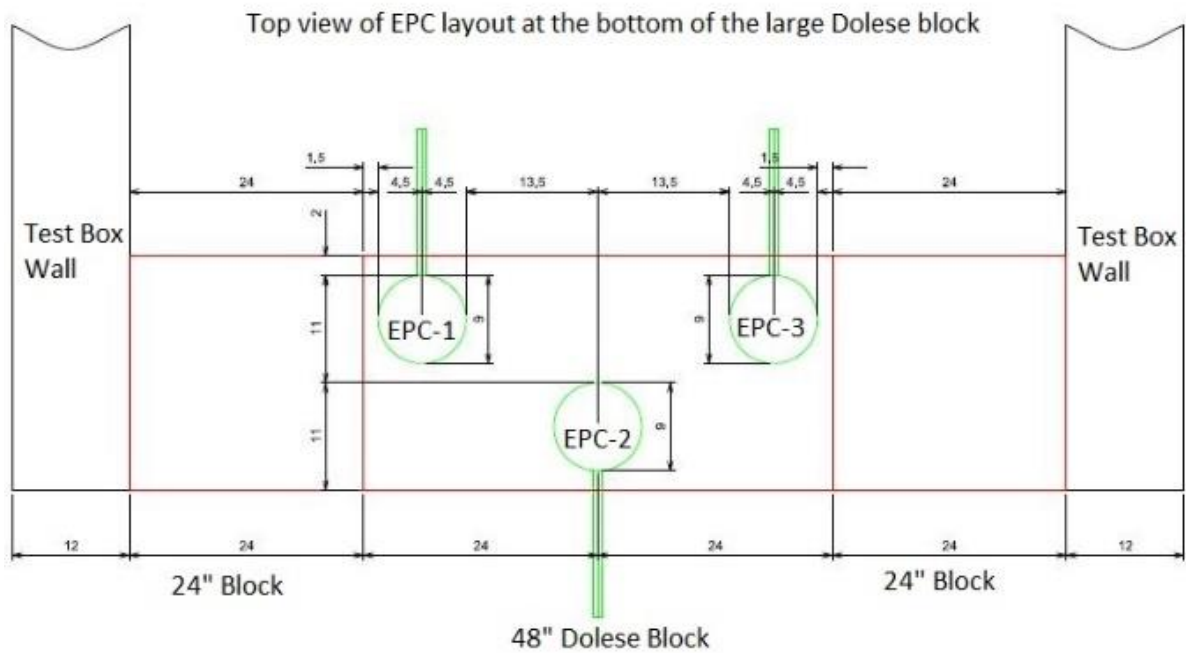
EPC layout under the facing of GRS Abutment Models #2 and #3 (plan view; dimensions are in inches)
